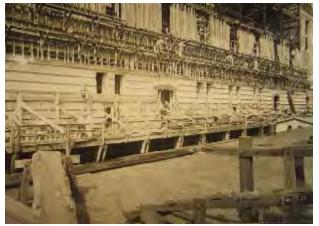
Construction of the Delaware Station, showing use of reinforced concrete, Photo c.1923. Source: PECO Archives.
